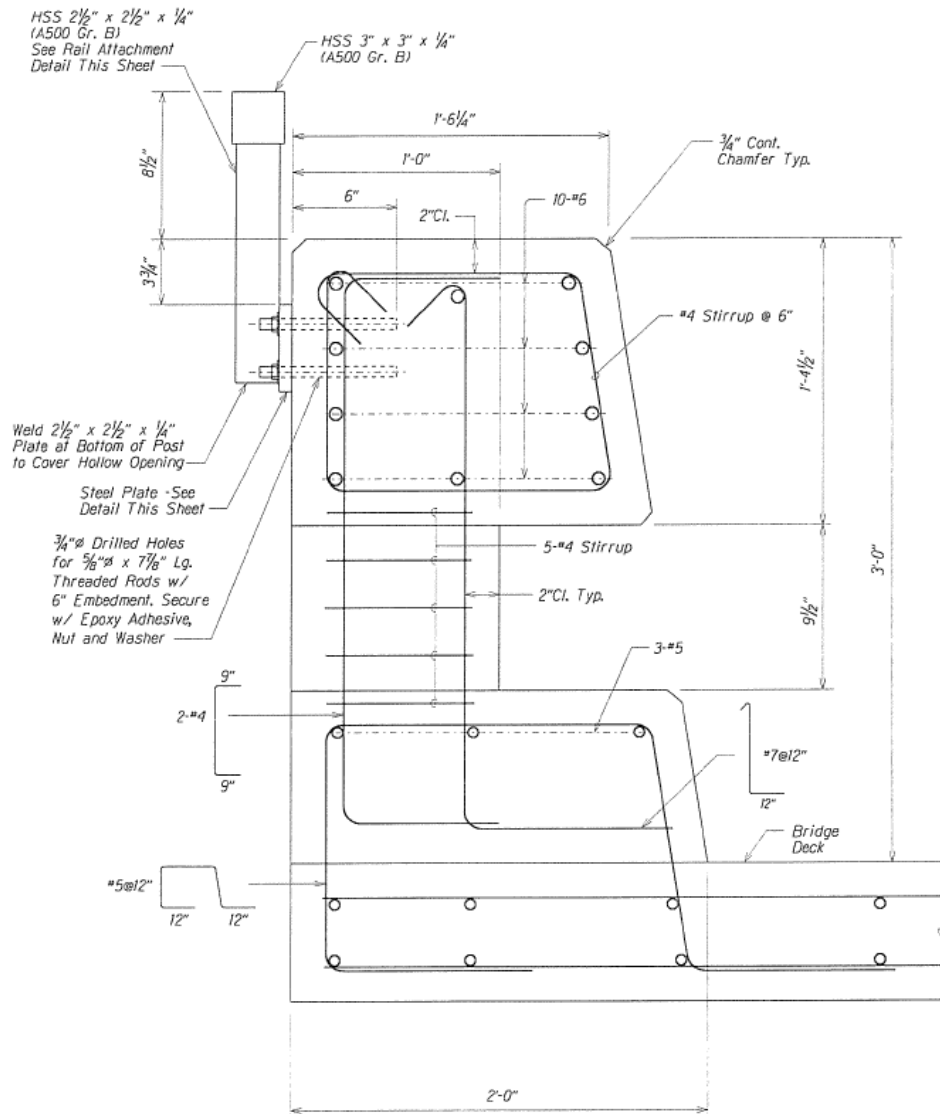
Hawaii Modified Natchez Trace Bridge Rail Design Details
